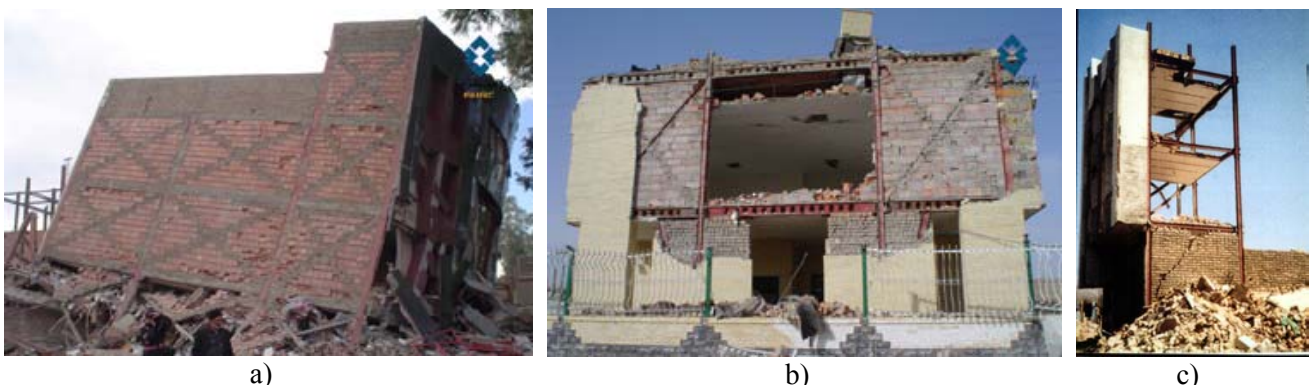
Observed damages of infilled steel frames: a) global collapse for soft storey mechanism and b) out of plan failure of the infill (Bam Earthquake, 2003); c) global collapse of the structure
